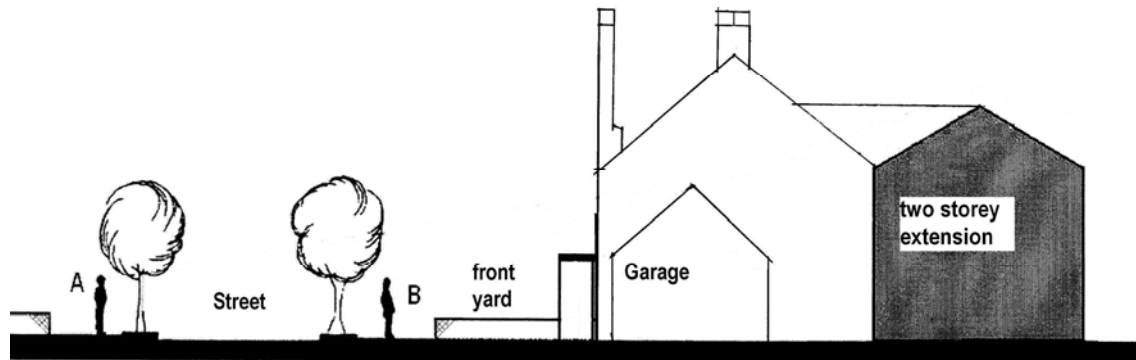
Side view of an acceptable two-storey addition to a two storey dwelling with the roof set lower than the main roof. If the new roof is visible it should be finished in Marseilles terracotta tiles to match the original roof.
